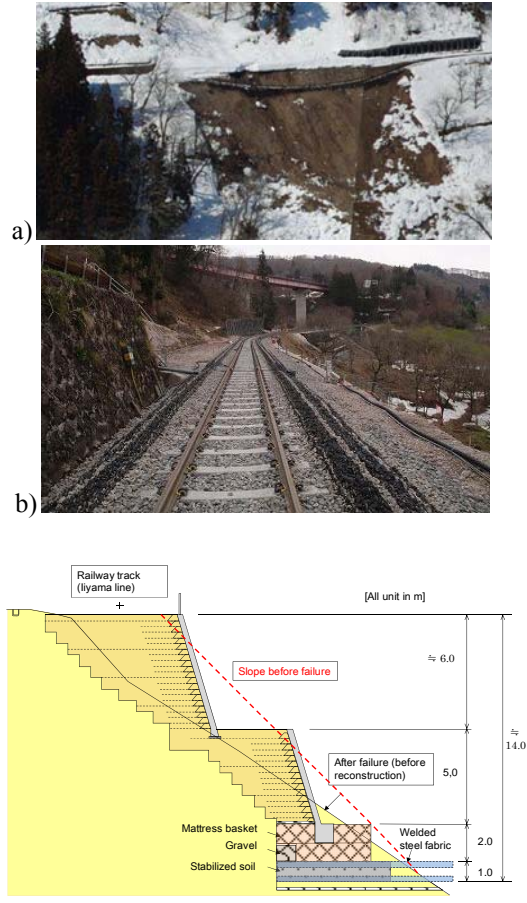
a) Embankment between Yokokura and Morinomiya stations, Iiyama Line, that collapsed during the Nagano-Niigata Border Earthquake; b) embankment reconstructed to a GRS-RW having FHR facing; and c) typical cross-section before and after reconstruction (by the courtesy of the East Japan Railway Co.)
